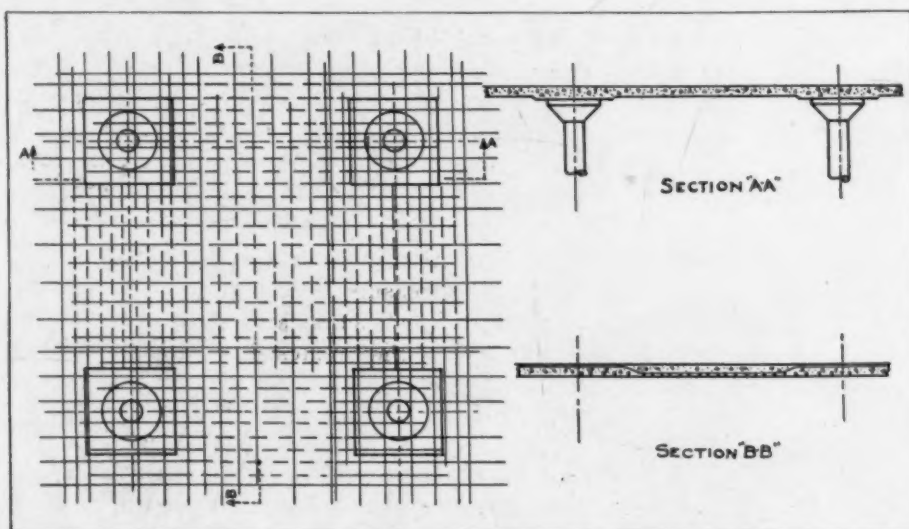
Diagram Showing Reinforcement and Slab Sections
